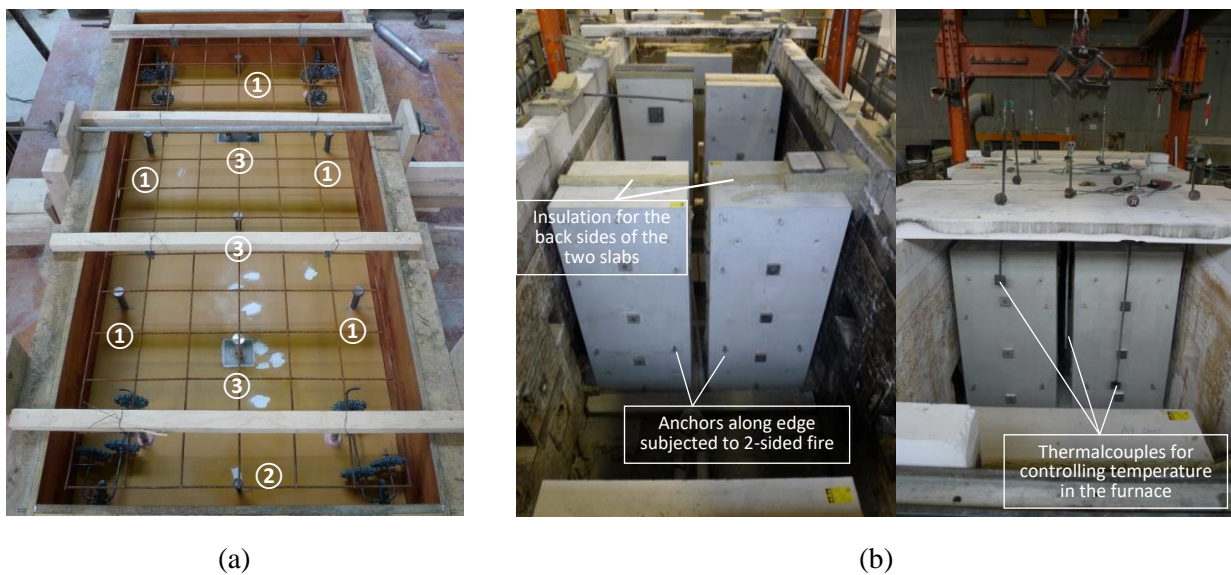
(a) Positions of anchors: ① indicates anchors installed near edge and subjected to two-sided fire; ② indicates anchors close to edge but subjected to only one-sided fire; ③ indicates anchors installed in-the-field for pryout failure in further study; (b) layout of the concrete slabs in the furnace.
